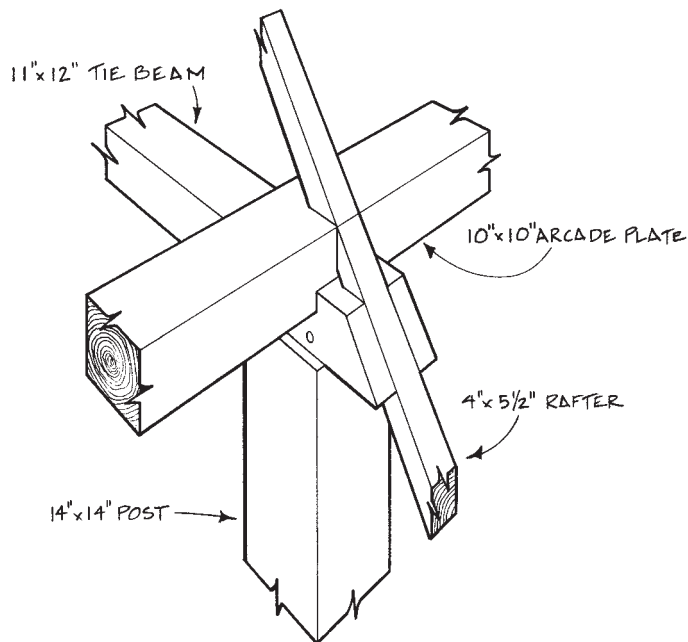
Reverse top plate assembly, Pioneer cable building.
